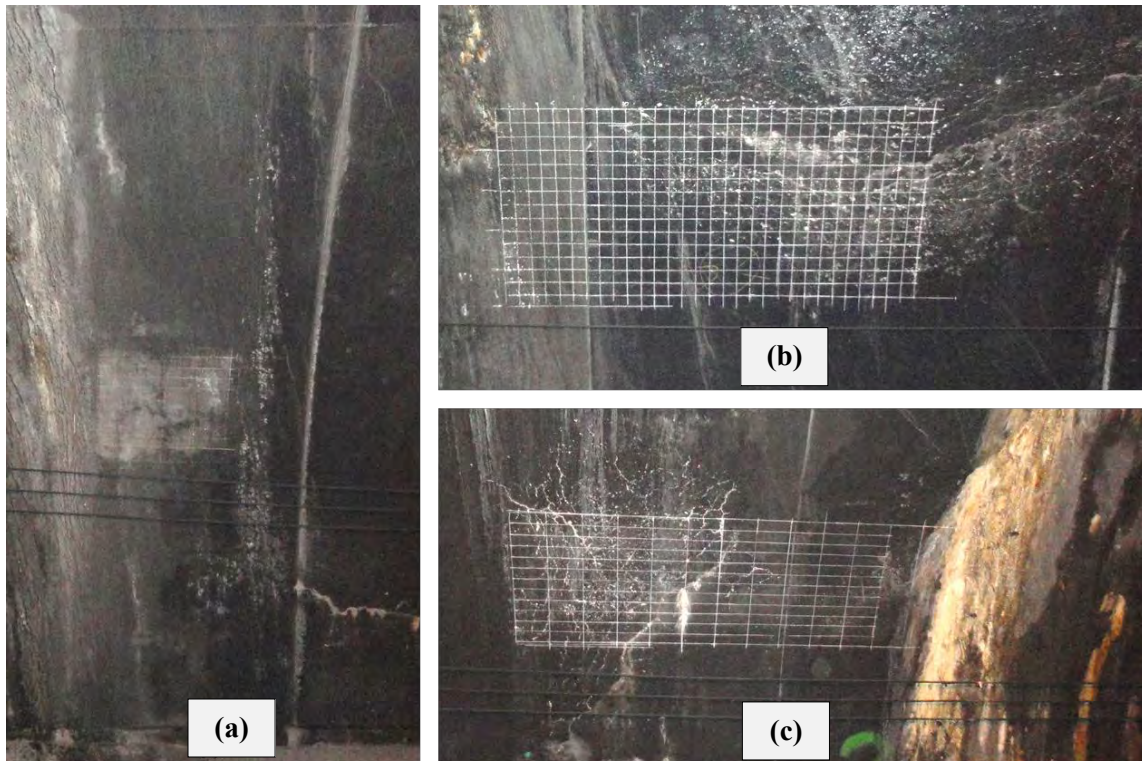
Scanned areas within Eisenhower Tunnel: (a) sound concrete, (b) surface cracking and crazing near joint, and (c) surface cracking and crazing near joint and crack with stalactite formation.
